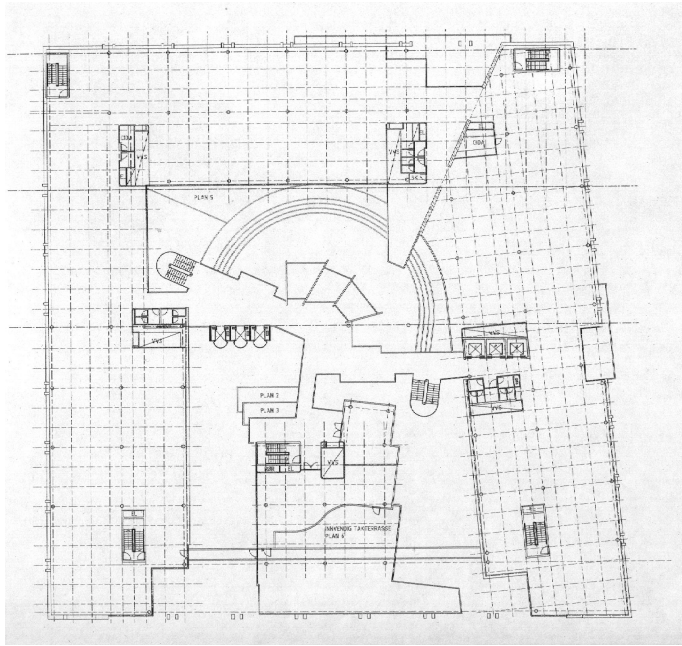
Floor plan (6<sup>th</sup> floor).
